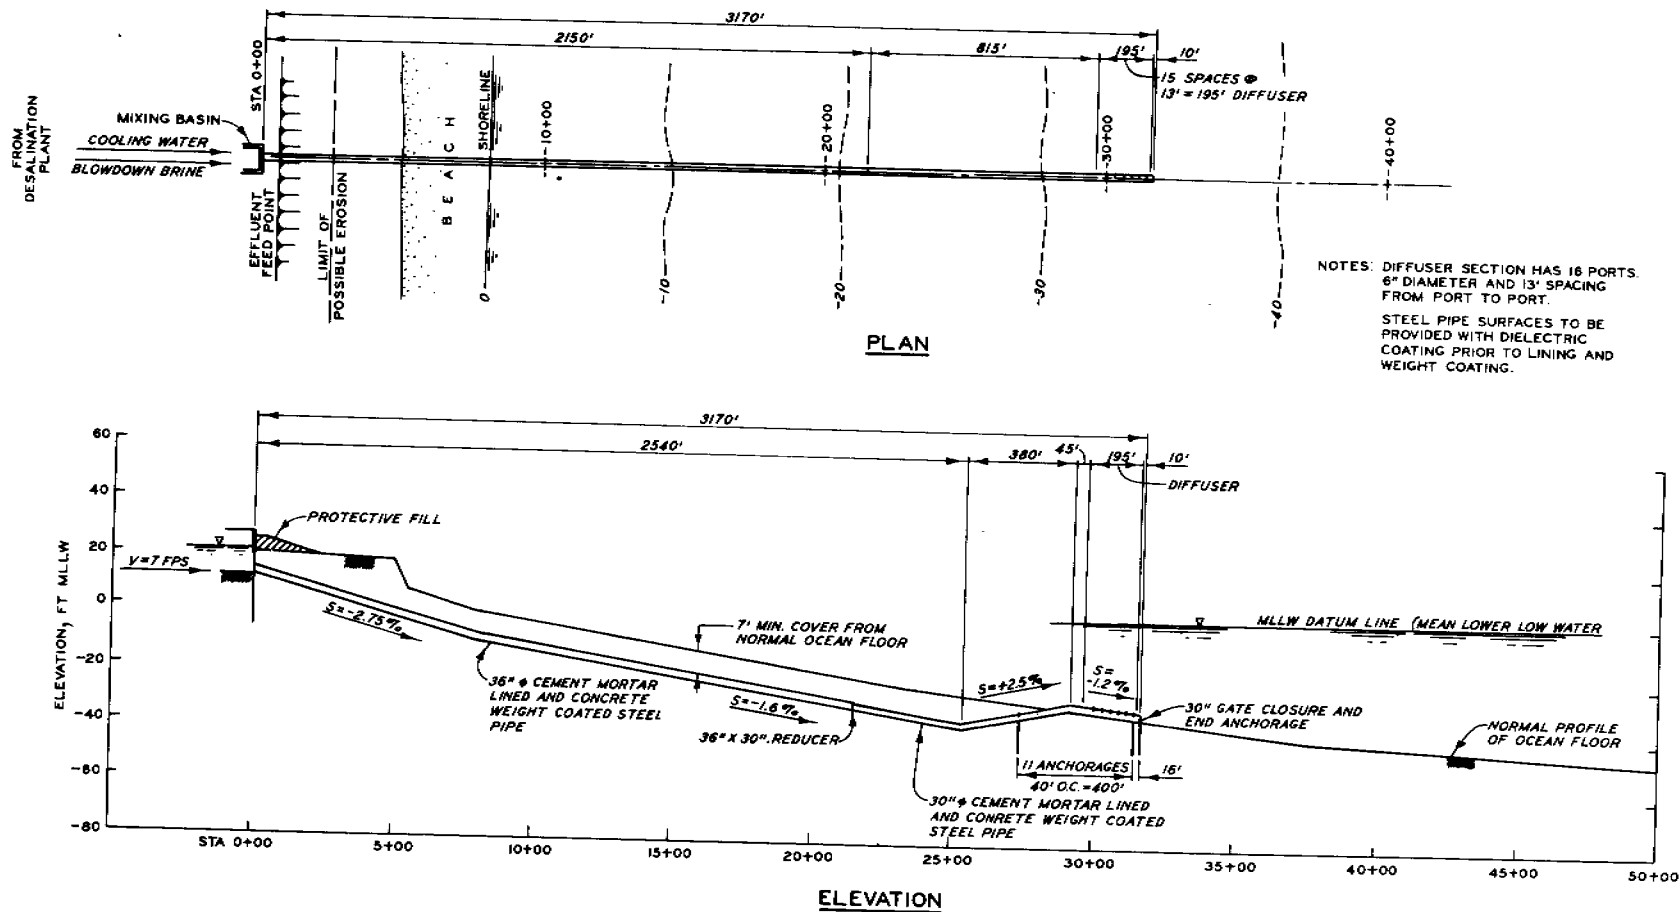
Plan and profile of typical outfall-diffuser, 10-mgd plant
